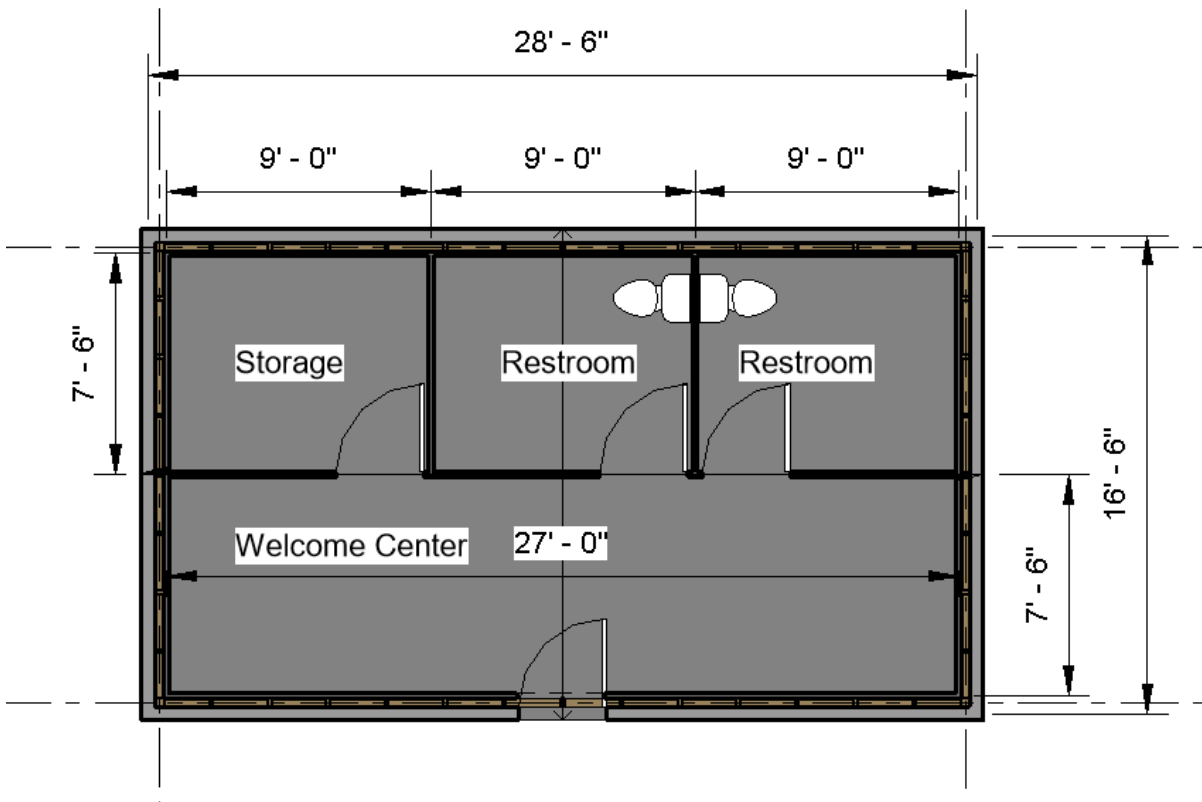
Restroom Alternative 2: Storage Room Replacement Floor Plan
